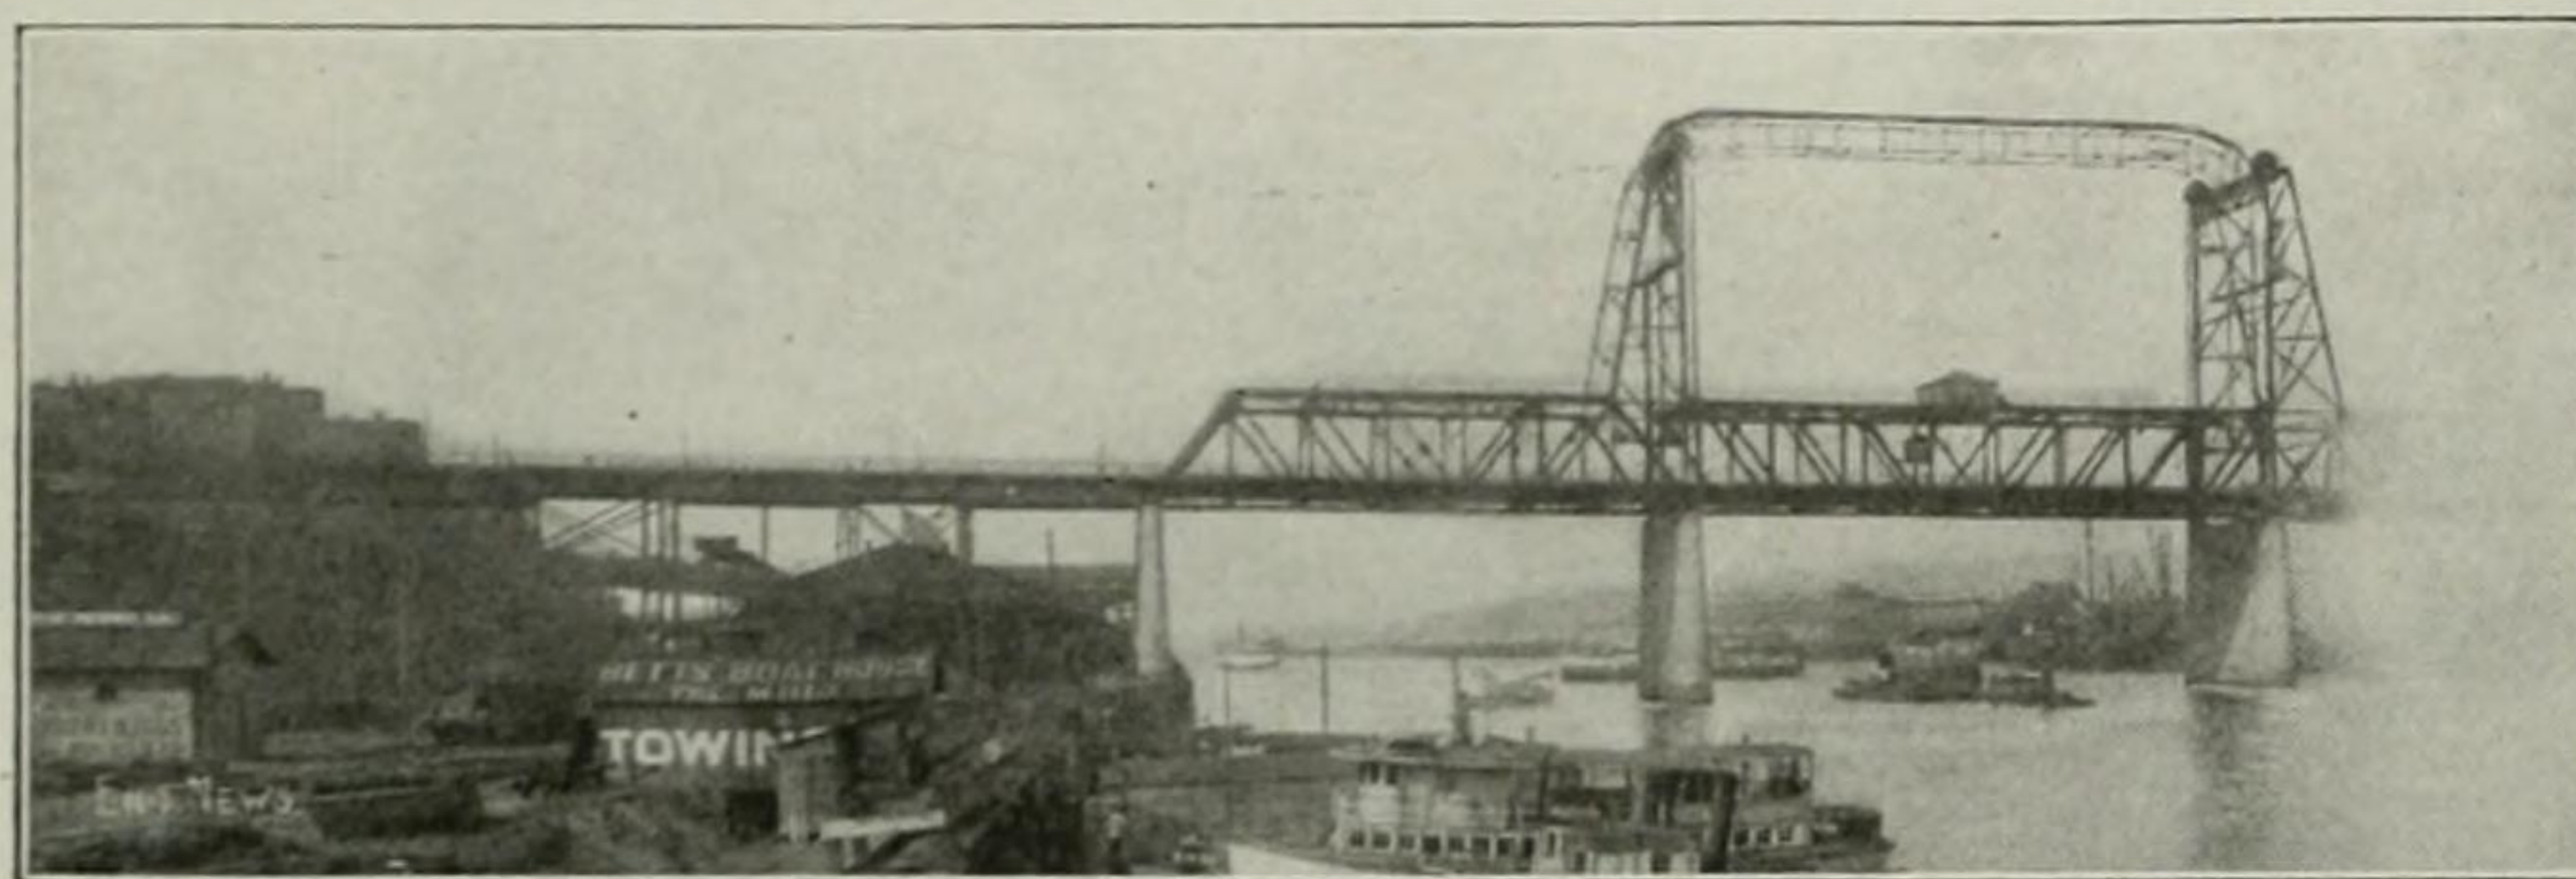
WEST PART OF BRIDGE, SHOWING DRAWBRIDGE CLOSED
